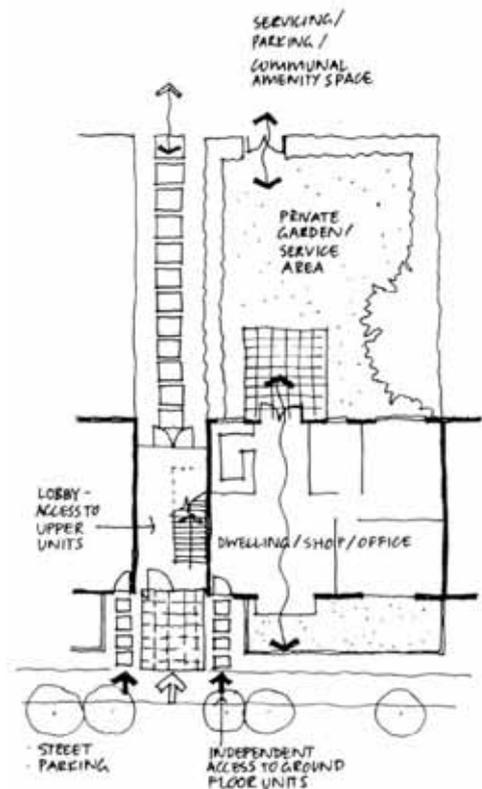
Individual plot layout with internal details, access and movement routes (CABE, 2008)
